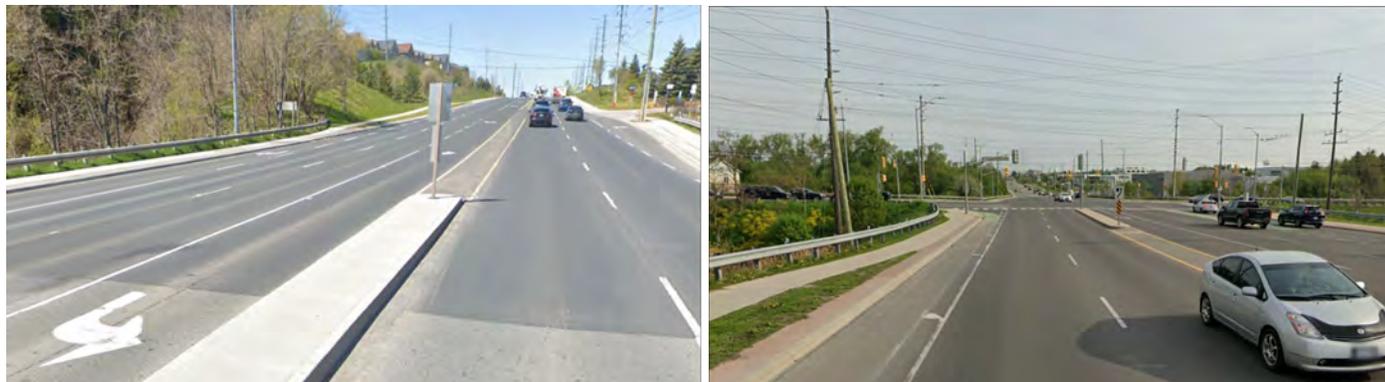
(1) Mulock Drive Looking West of Leslie Street (2) Leslie Street Looking North Towards Mulock Drive. (Google Maps "Streetview," digital images <http://maps.google.com>)
